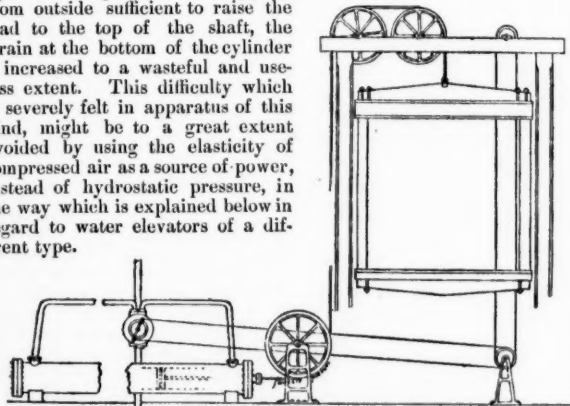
The Stebins Hydraulic Elevator, with Flexible Piston.
